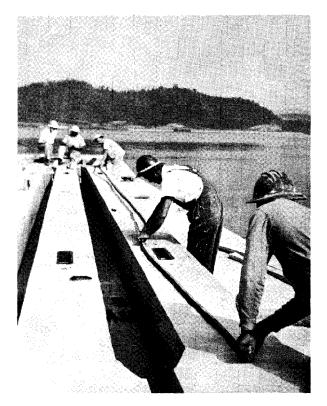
Leakage between the concrete skimmer wall beams was minimized by using rubber seal strips glued in position before placing the beams.
